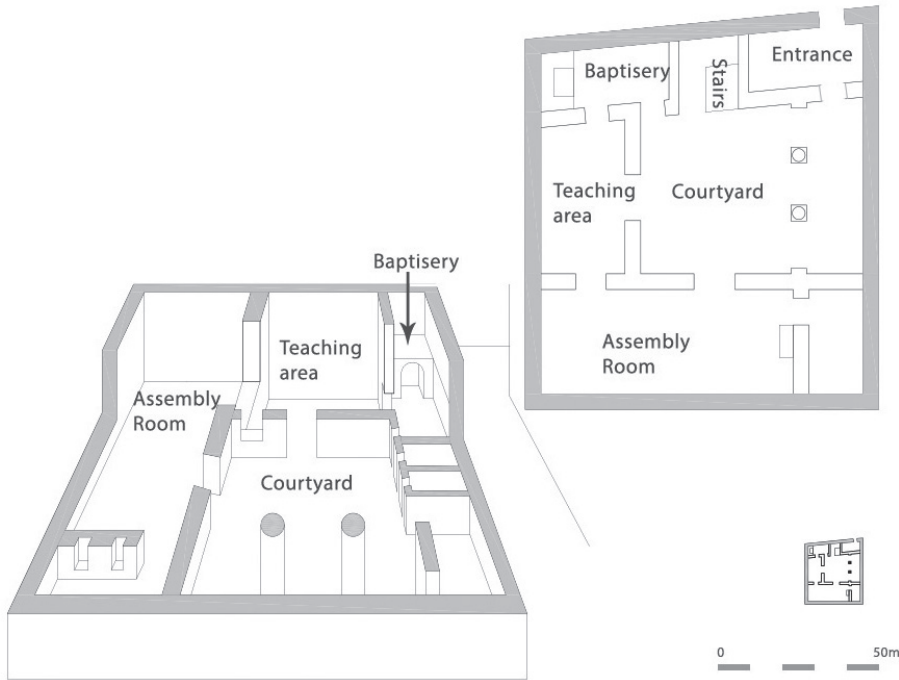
Dura-Europos (Plan 1: Plan of the House-Church after alteration. without scale; Plan 2: Plan of the House-Church after alteration with scale)
